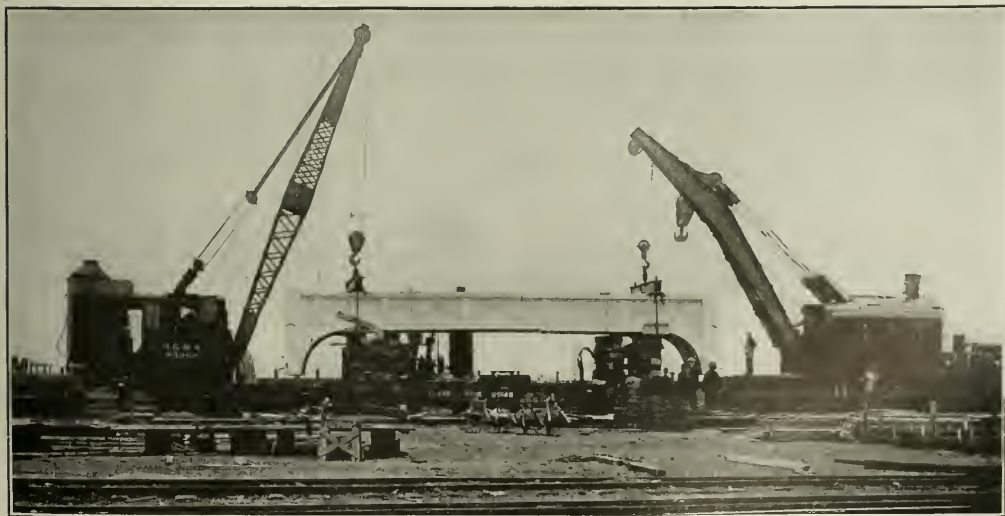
LIFTING THE 57-TON CONCRETE BRIDGE IN THE CASTING YARD
